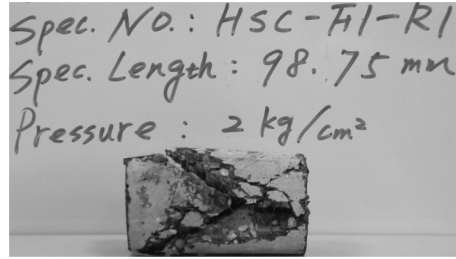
Fracture mode of HSC-F1 specimen after one impact
